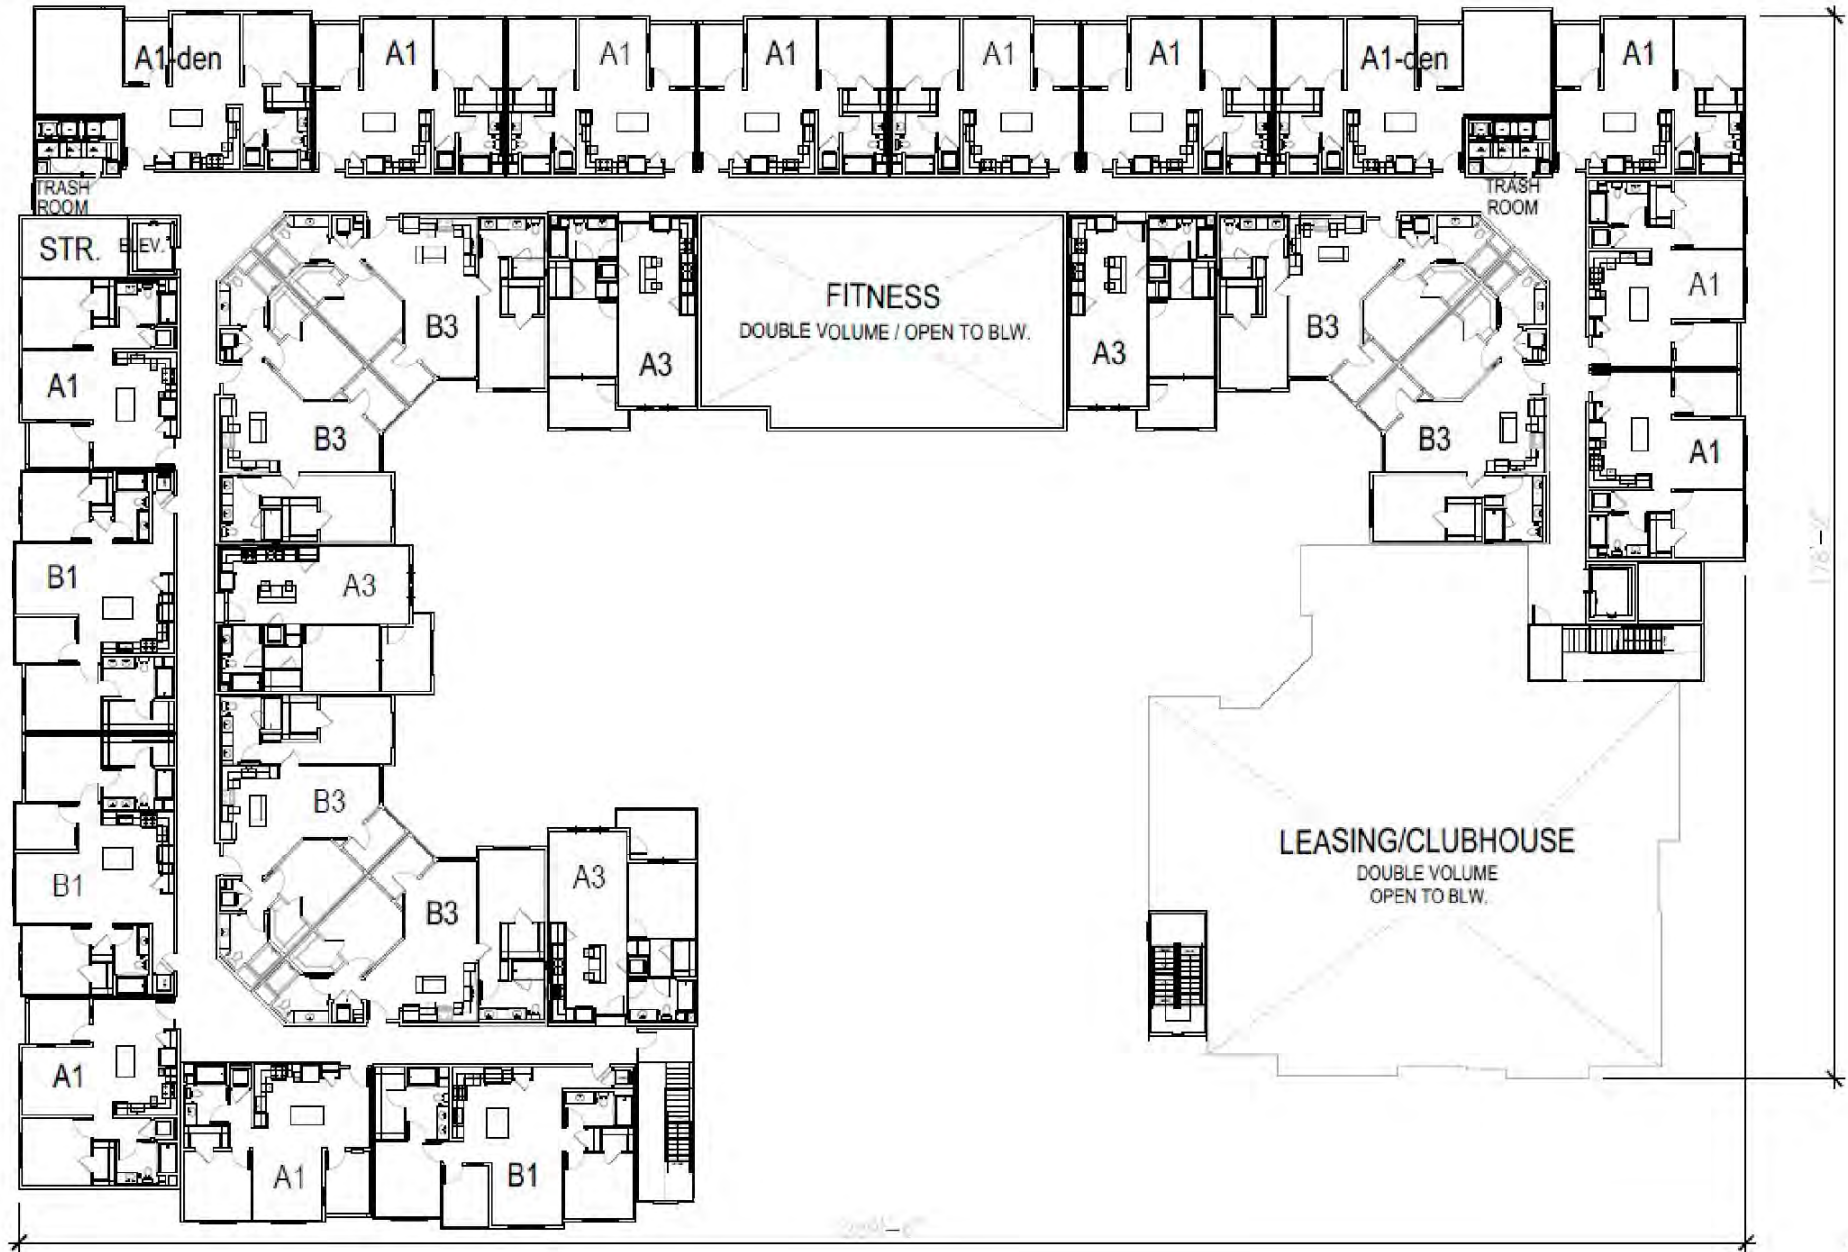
Type D Building 9 - 2nd Floor Plan
